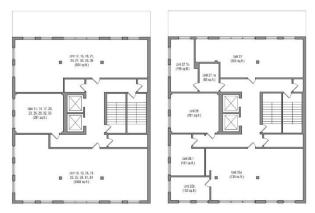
, 665 (left to right): Building 8, ninth floor (1926); same floor (1981). North is to the left.
